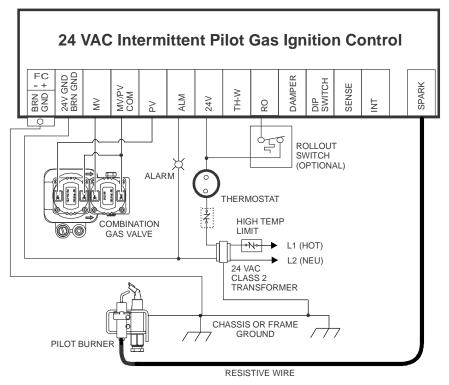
Wiring for 1 Rod Flame Sense used for Local (Internal) Sense
